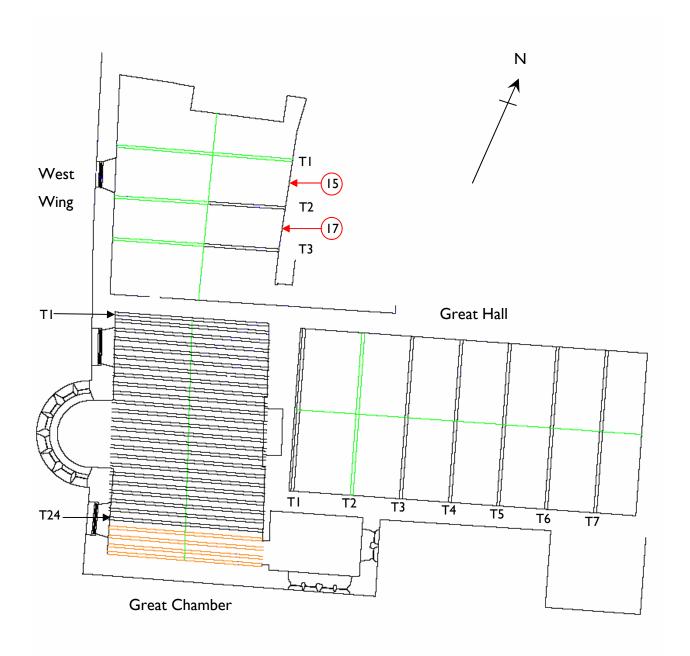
Plan showing the truss numbering scheme and the locations of samples TRC-E15 and E17 (based on a drawing provided by Nigel Thomas)
